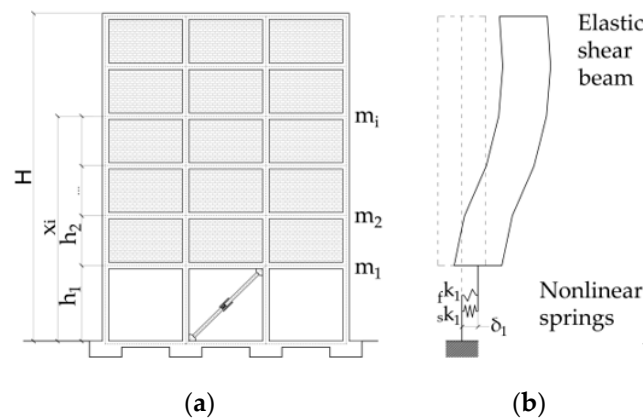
Typical structure with dampers' (a) elevation, and analytical model (b).
